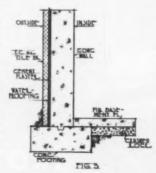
A satisfactory method of dampproofing a basement wall and floor under ordinary conditions of moisture.
